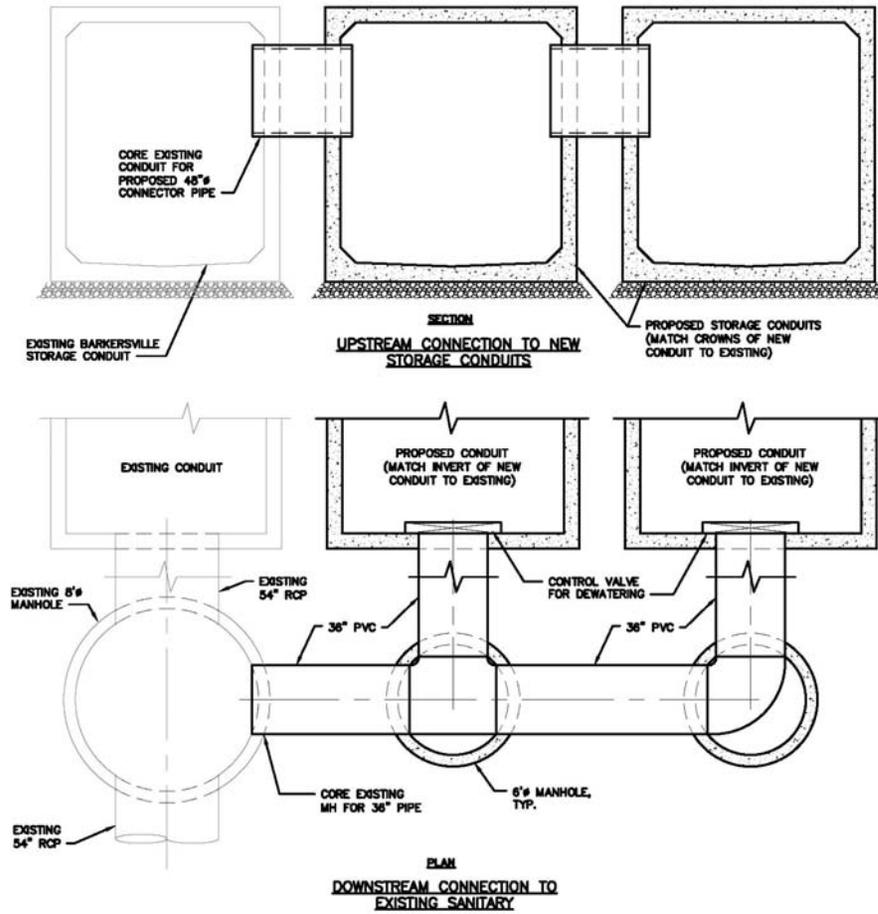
Barkersville Conceptual Parallel Conduit Layout
